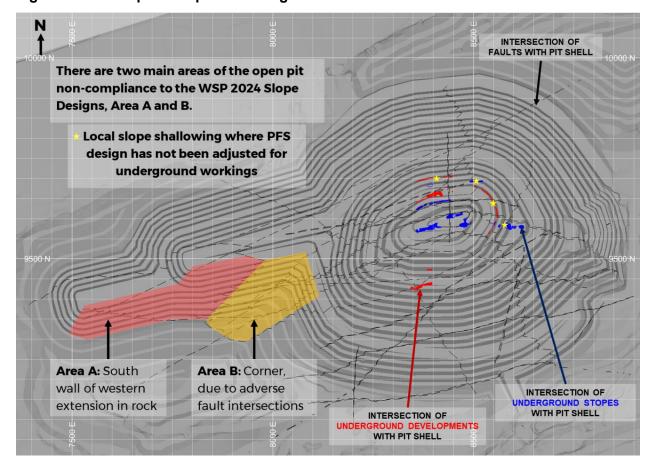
Proposed Open Pit Design Areas A and B Schematic
